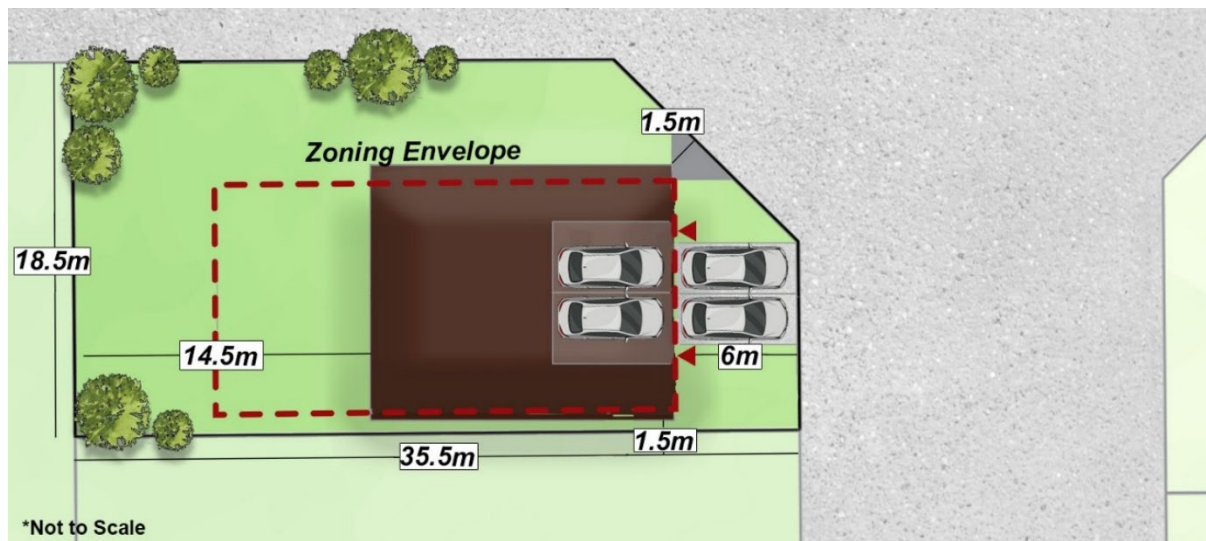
Semi-detached Dwelling Corner Lot Concept Plan
